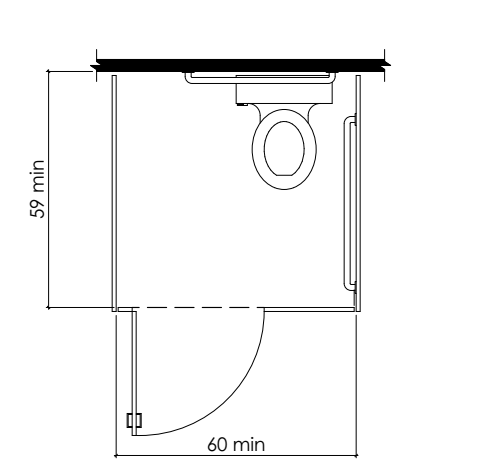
Wheelchair Accessible Toilet Compartment Doors
